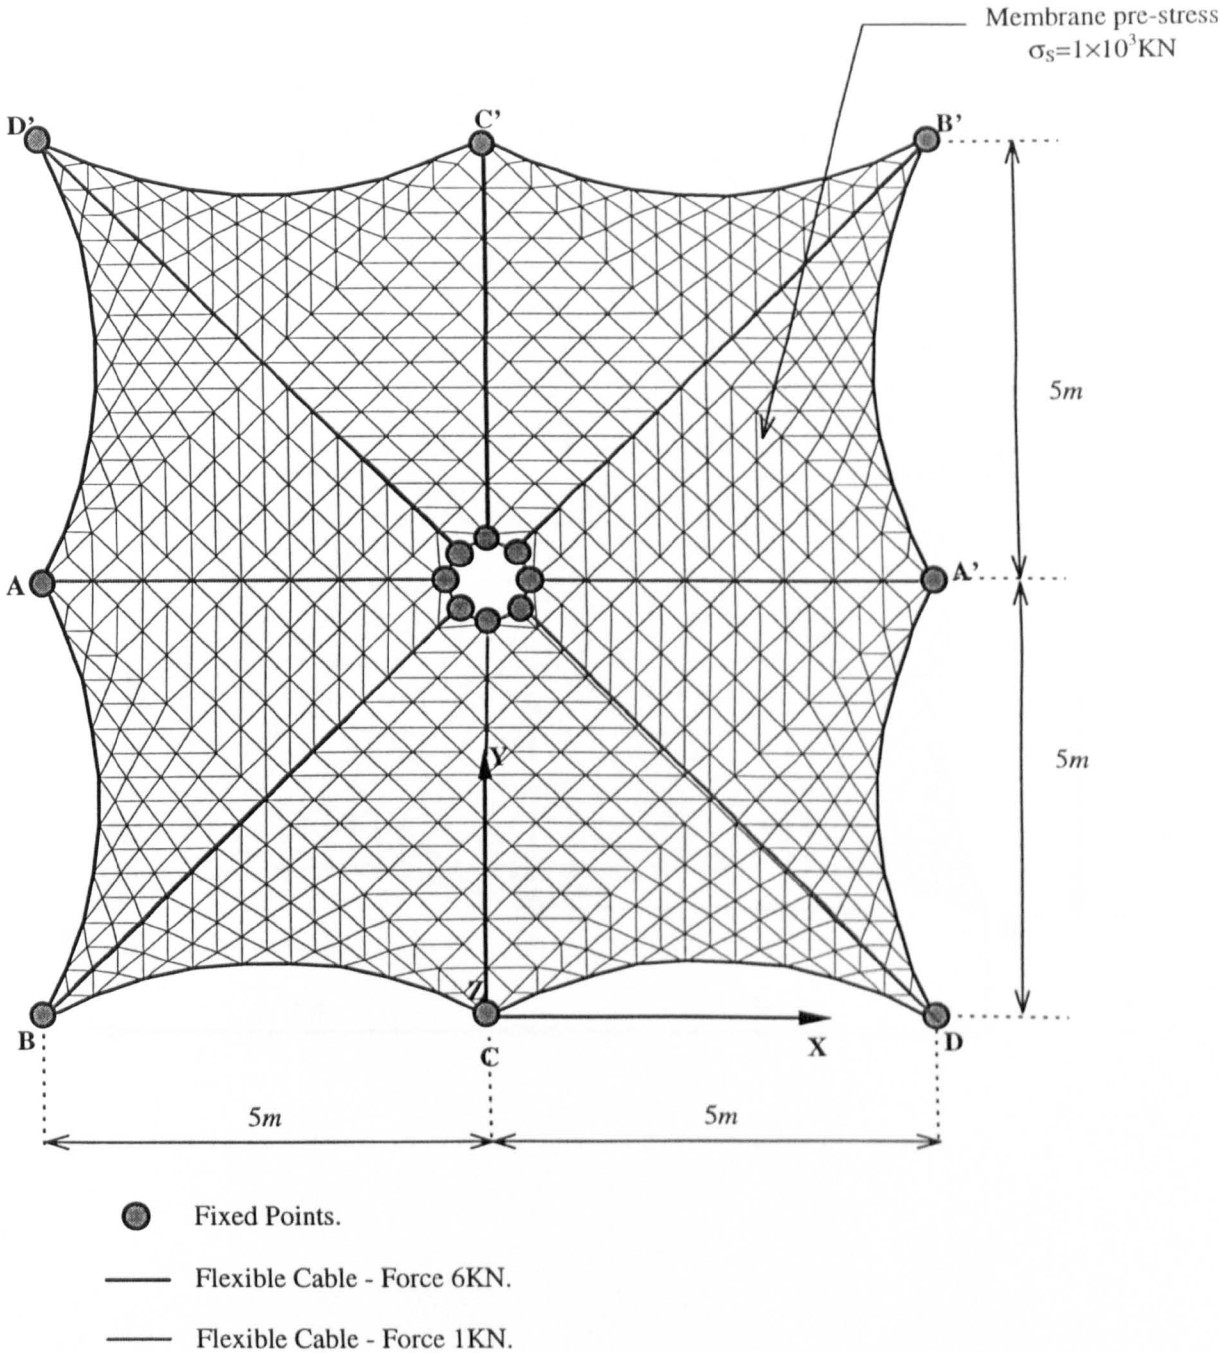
Initial Surface (Example 5.2.6) - Plan View.
